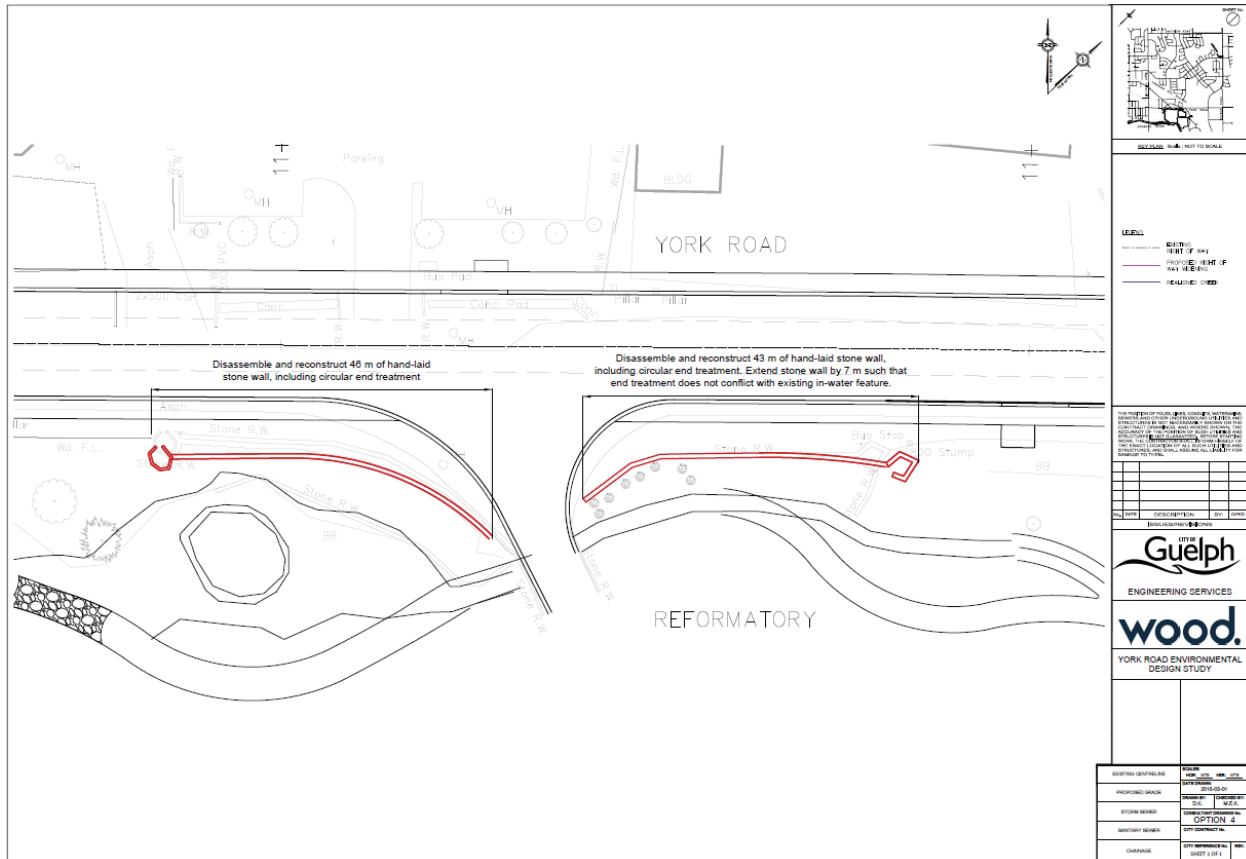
Roadway Plan View for York Road Alternative 4.
